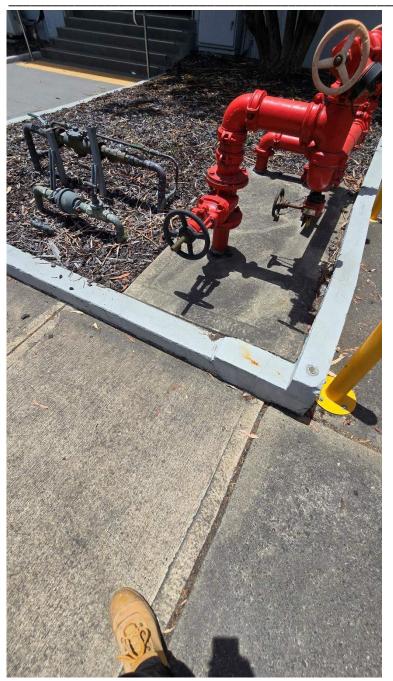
Cracks observed (16) - Misalignment of retaining wall
